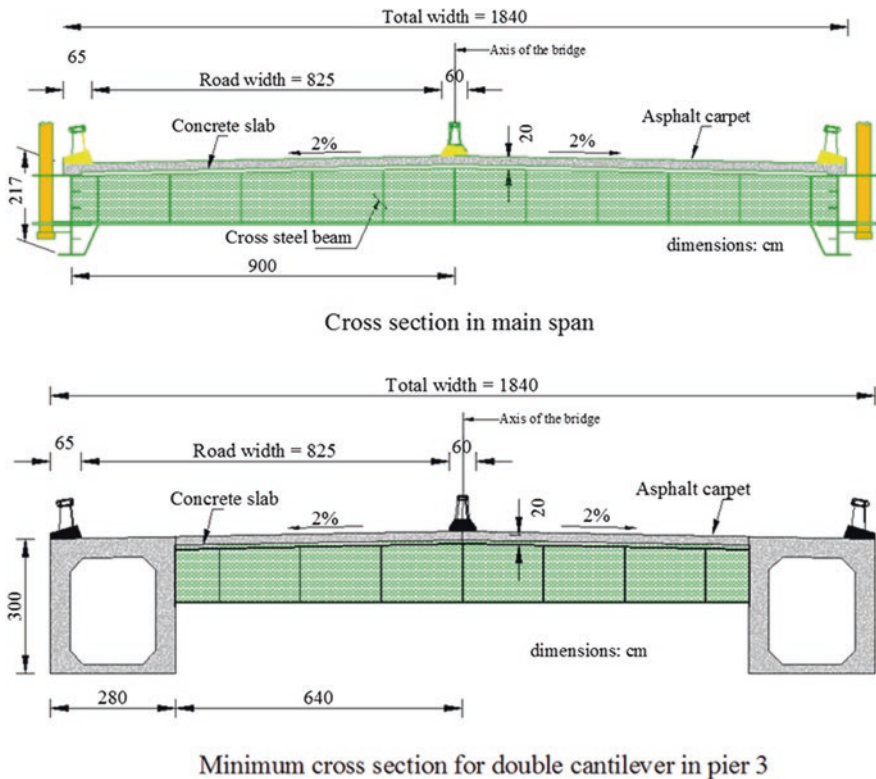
Cross sections of the superstructure, “Carrizo” bridge
